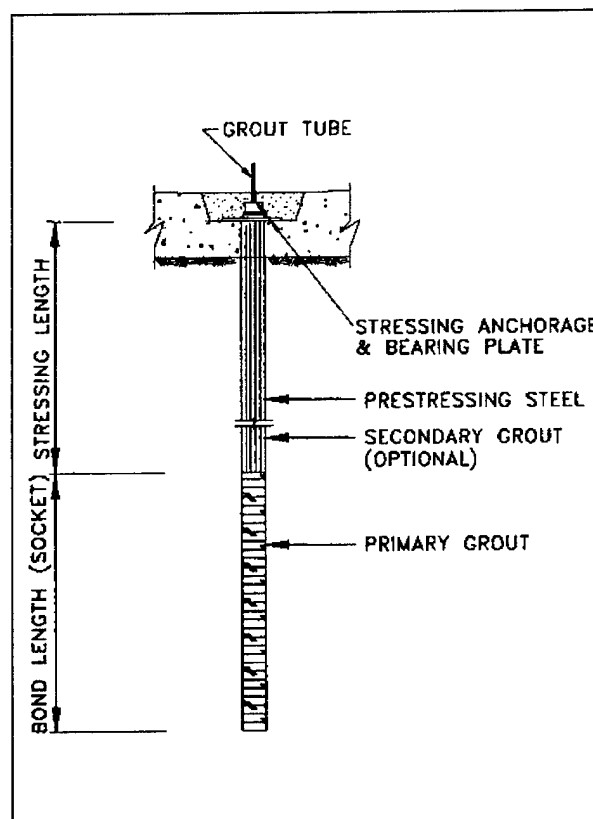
Typical components of a tensioned rock anchor (from EM 1110-1-2907)
